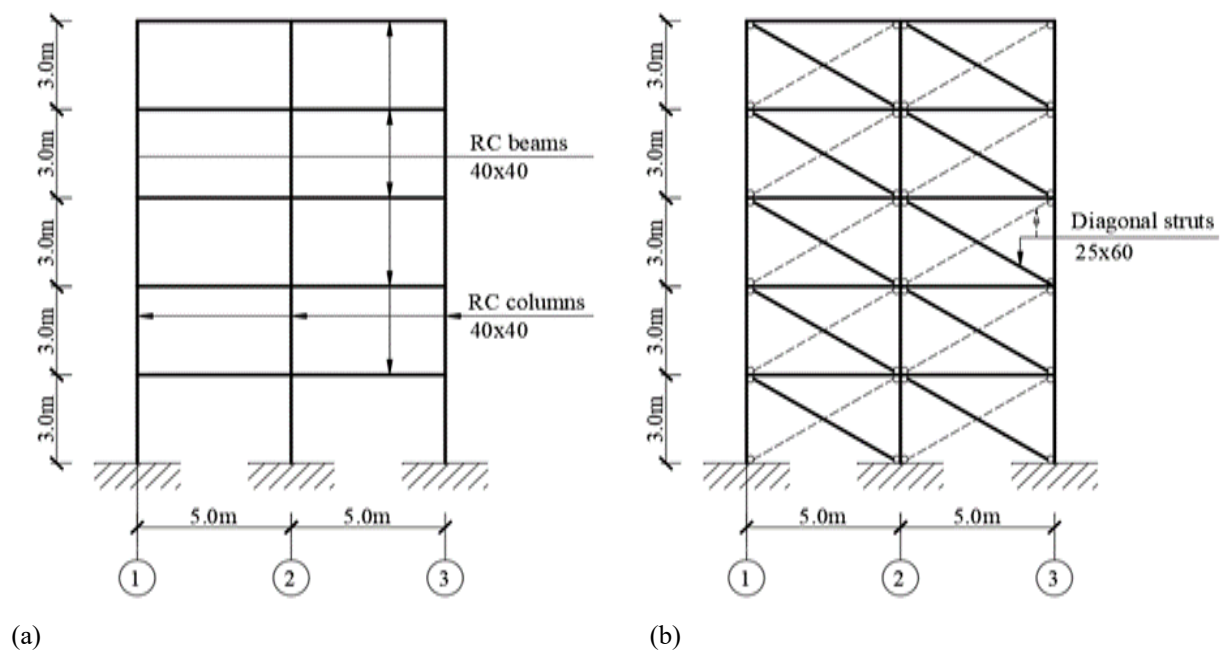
Elevation view of RC frame: benchmark (a), with infill panels (b)
